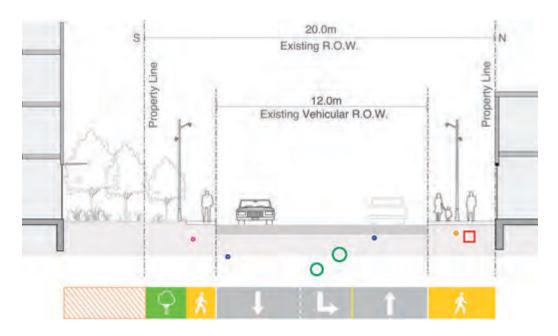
Section of the Existing Conditions of Broadway Avenue intersection with Mount Pleasant Road
